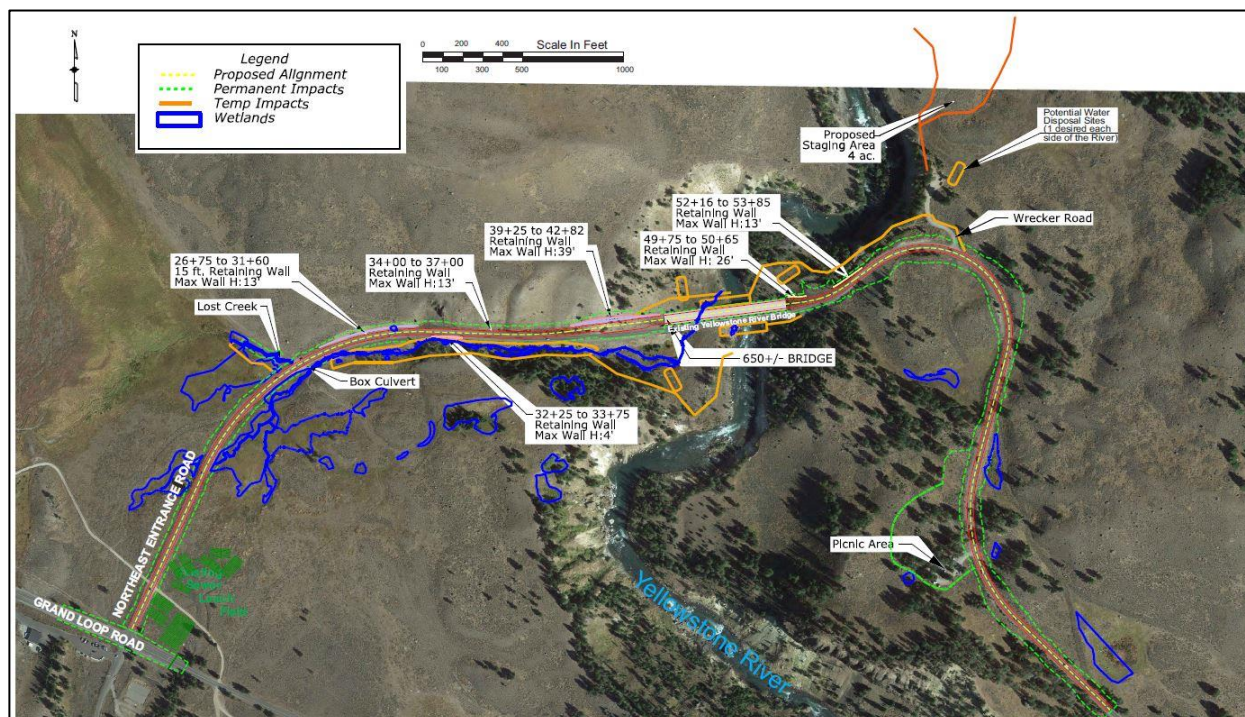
Alternative C-existing alignment, new bridge parallel to the existing bridge on the north side (steel girder bridge).
